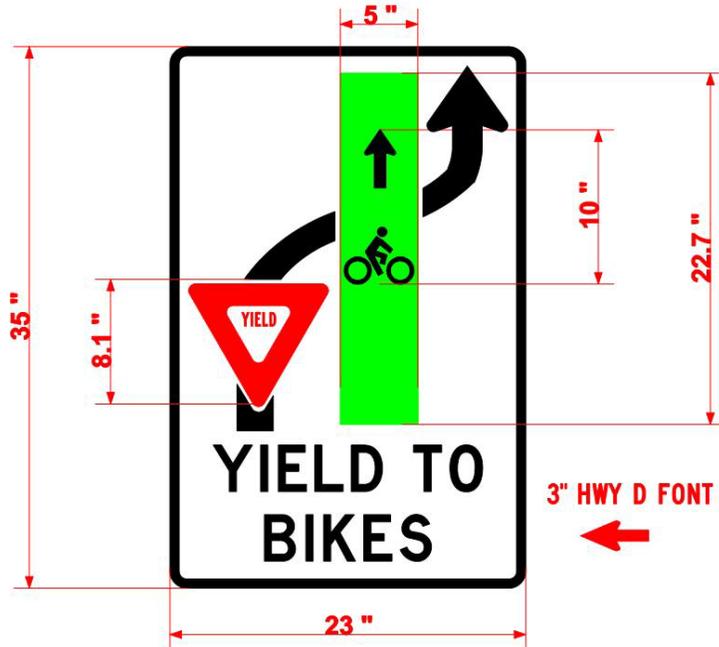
Detail of the "Yield to Bikes" sign that was installed at the study location on San Jacinto Boulevard
